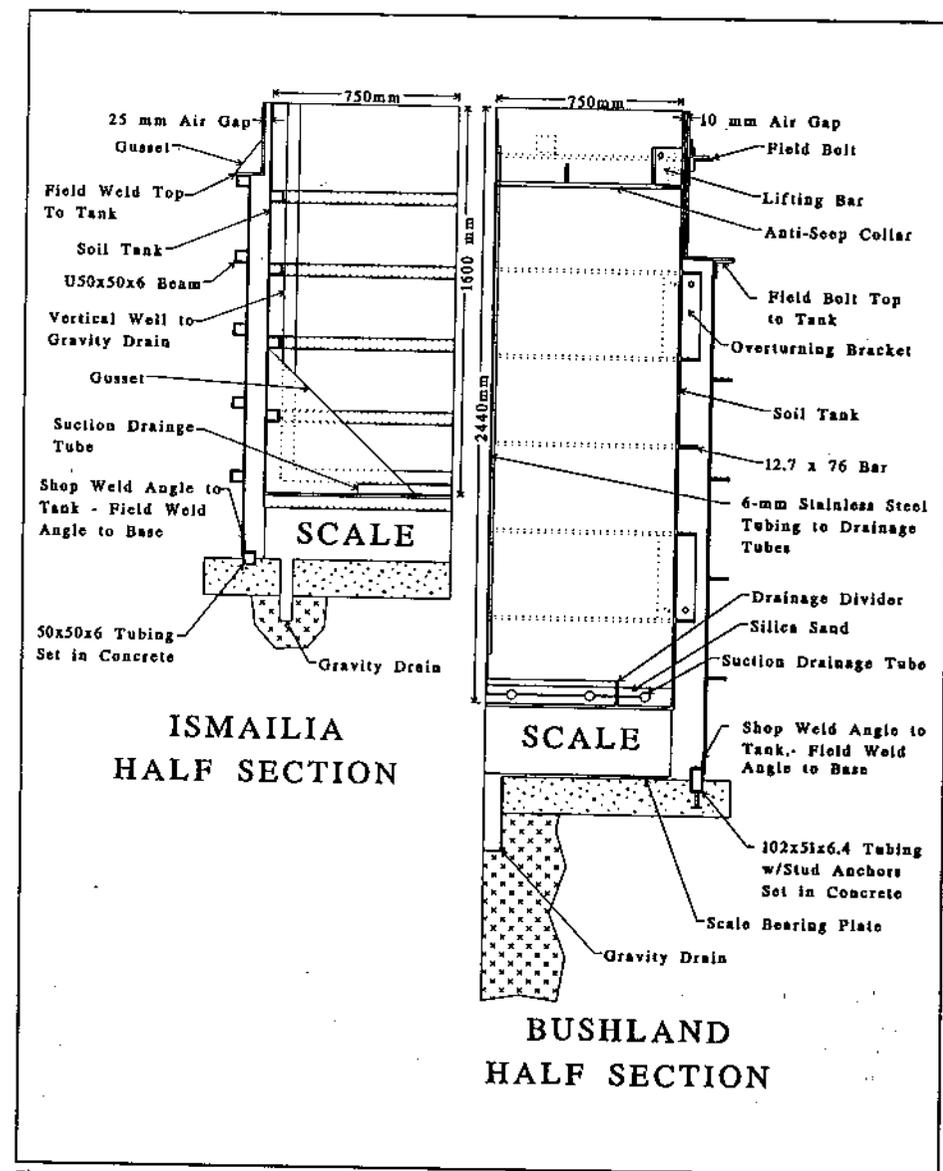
Half cross sections of the Bushland and Ismailia lysimeters illustrating design details.
